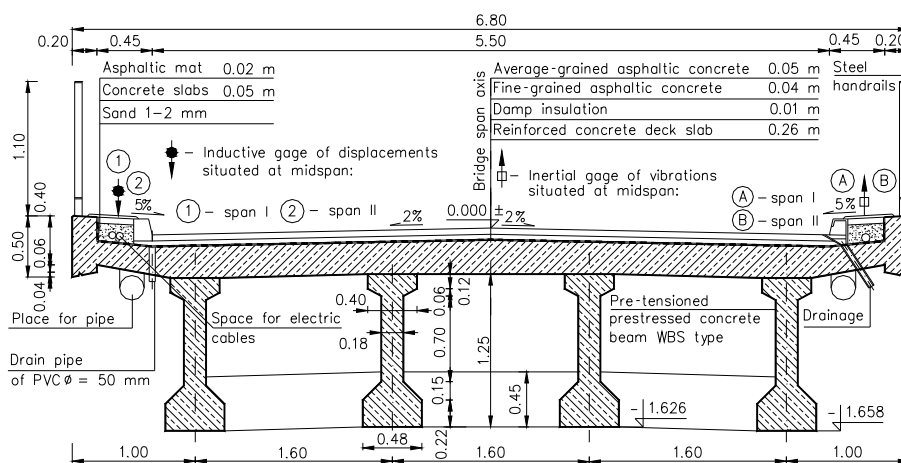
Cross-section of bridge span and localization of dynamic gages.
